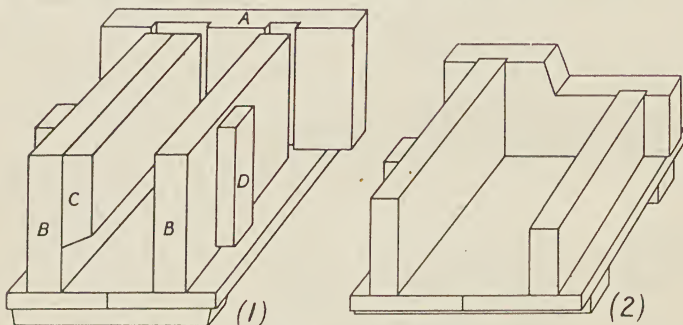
MOULD FOR INTERNAL LINTEL.
